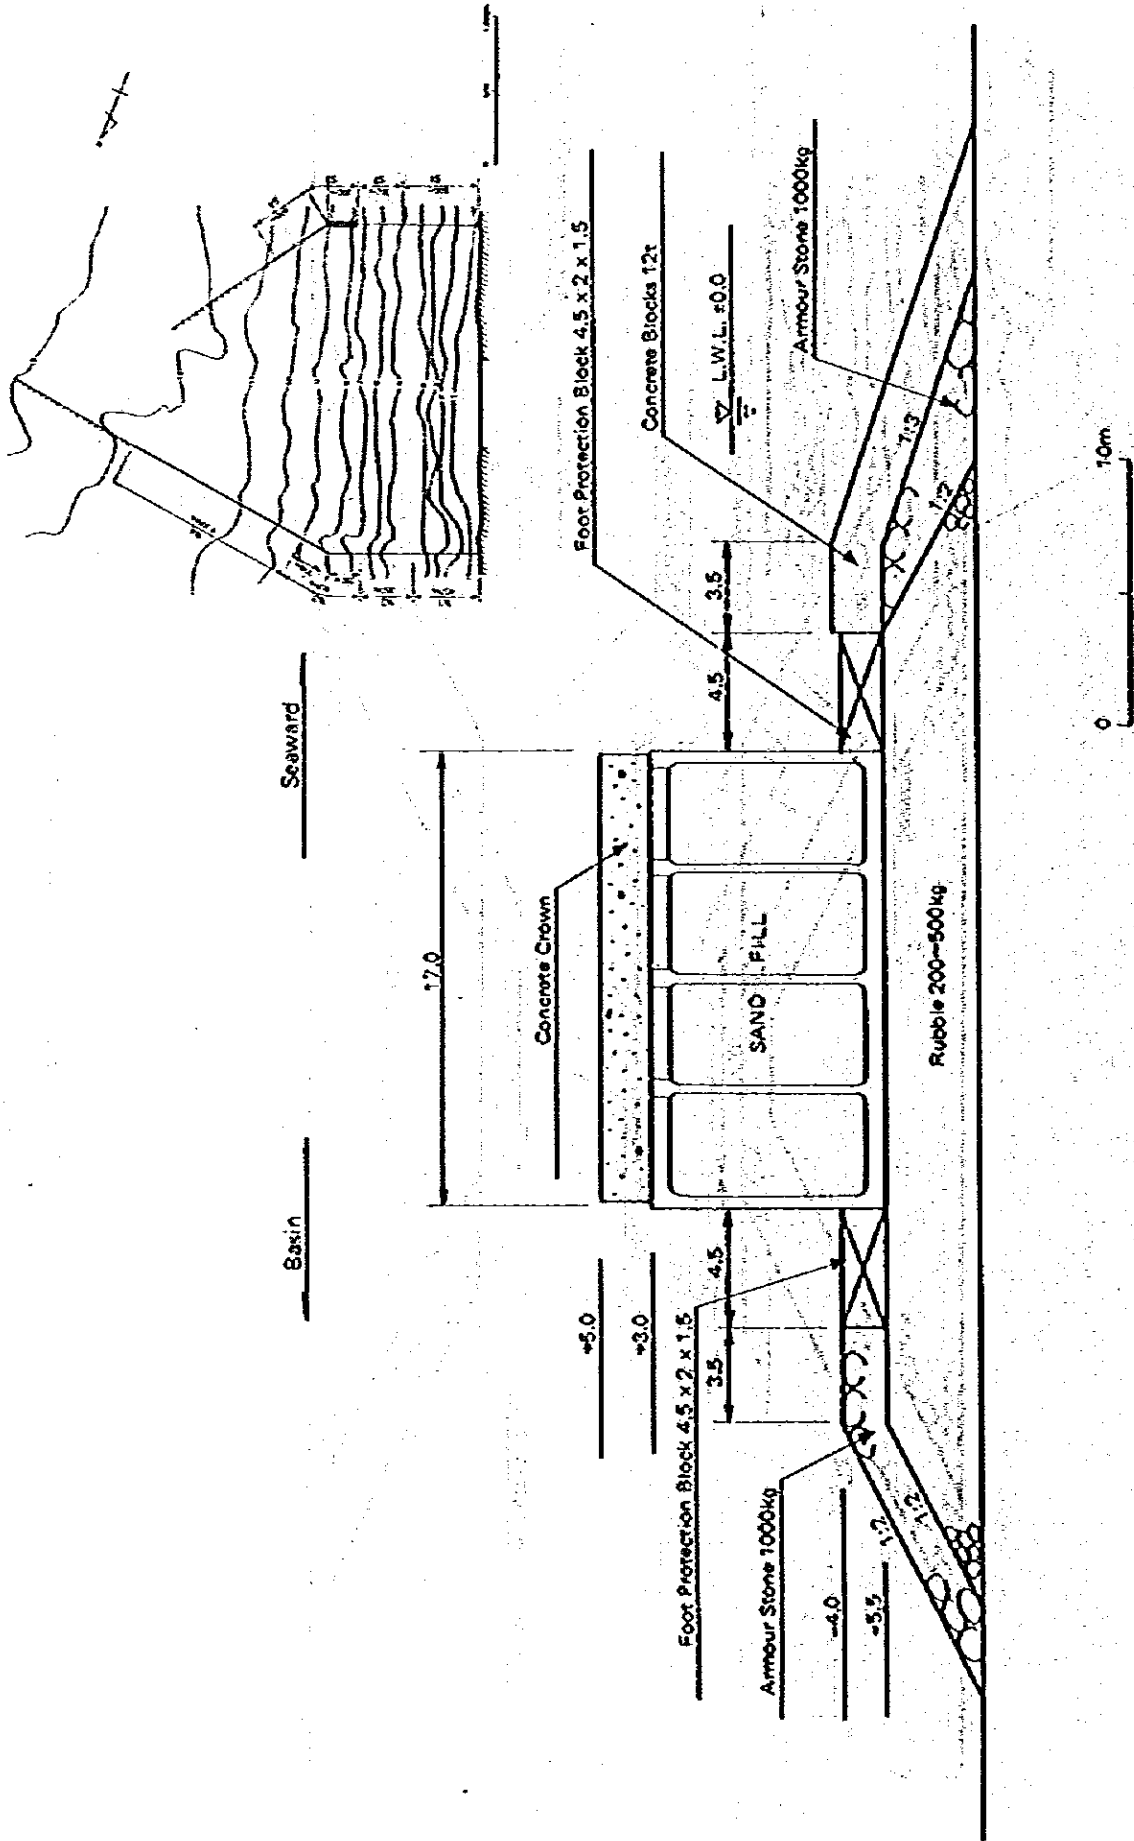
(8) Standard Crosssection of Breakwater (S3 Section)
